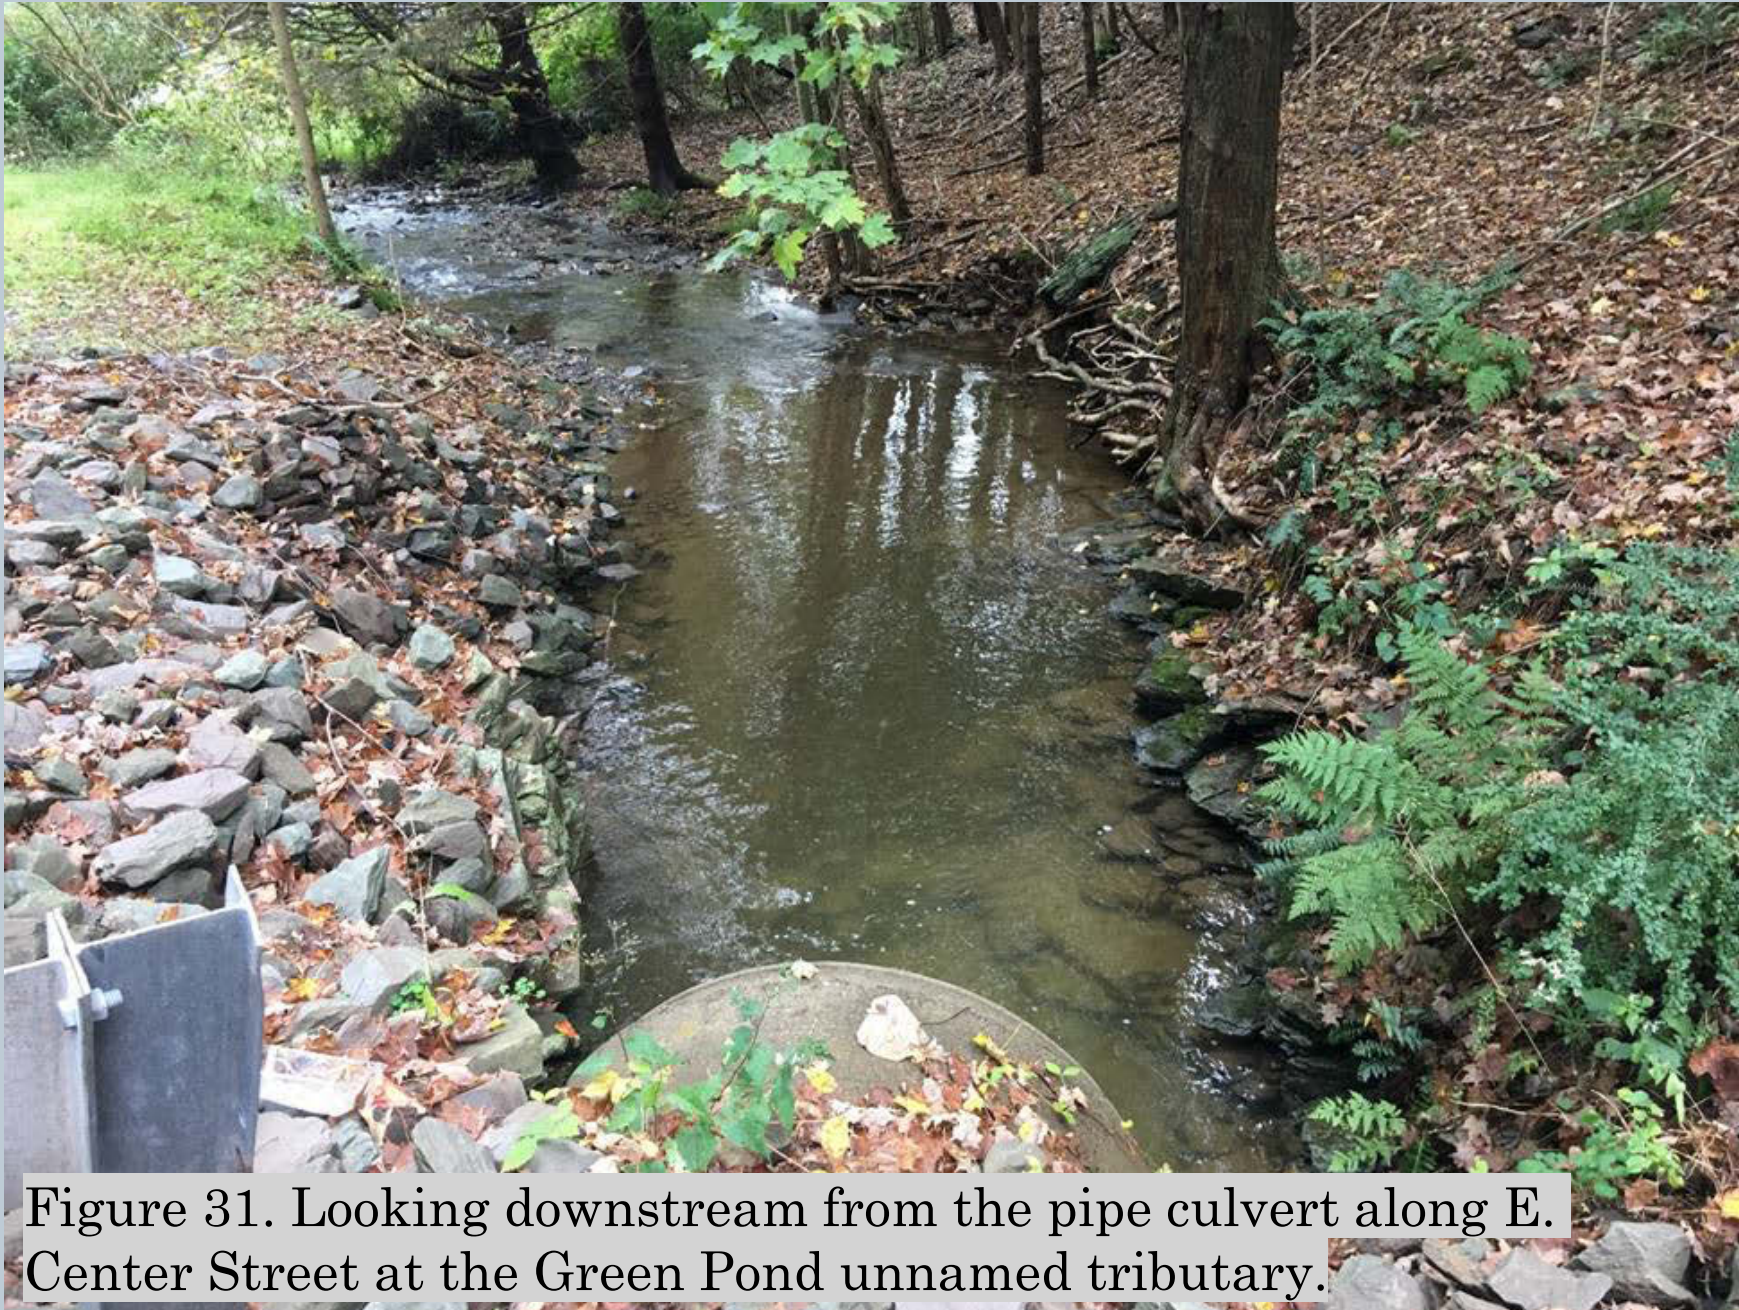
Looking downstream from the pipe culvert along E. Center Street at the Green Pond unnamed tributary.
